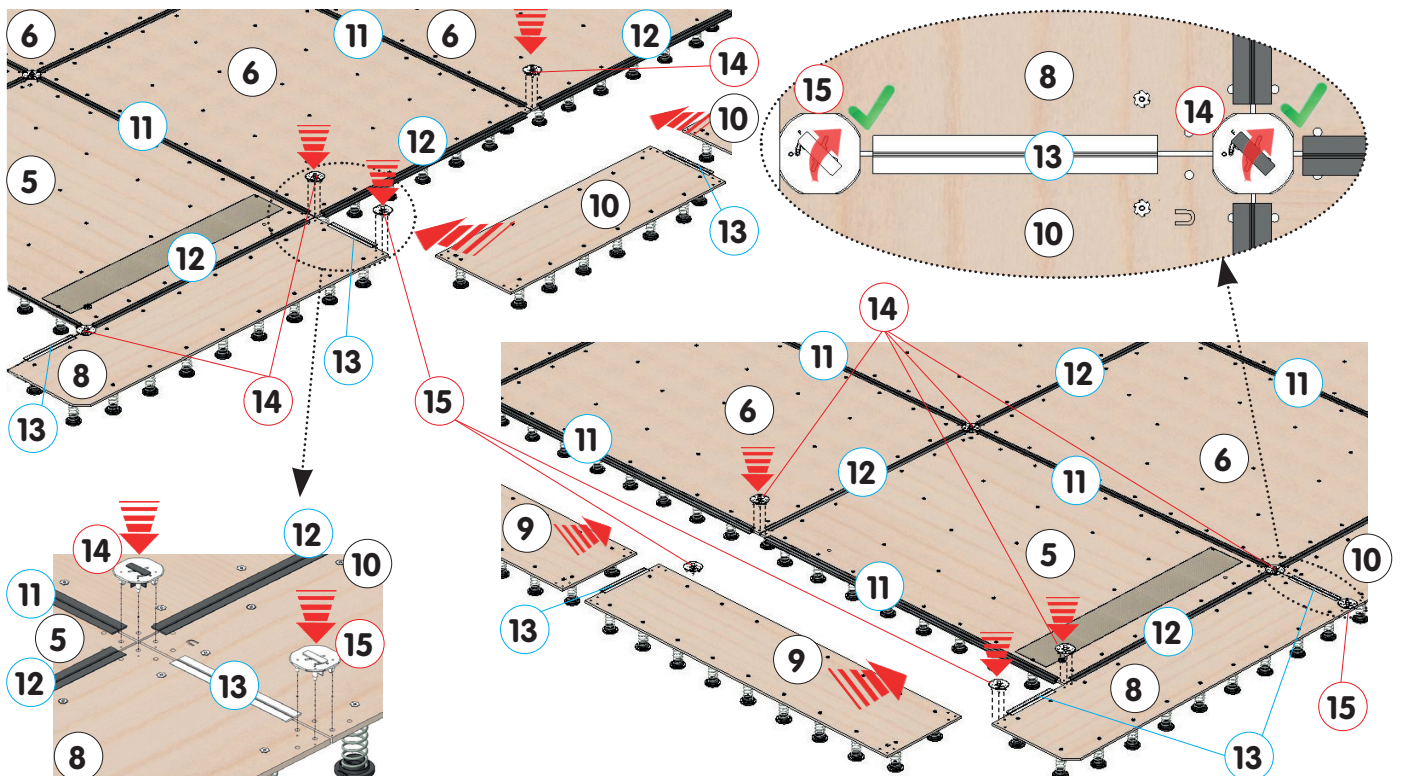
& details - Installation of the connecting parts on the central part of the floor
